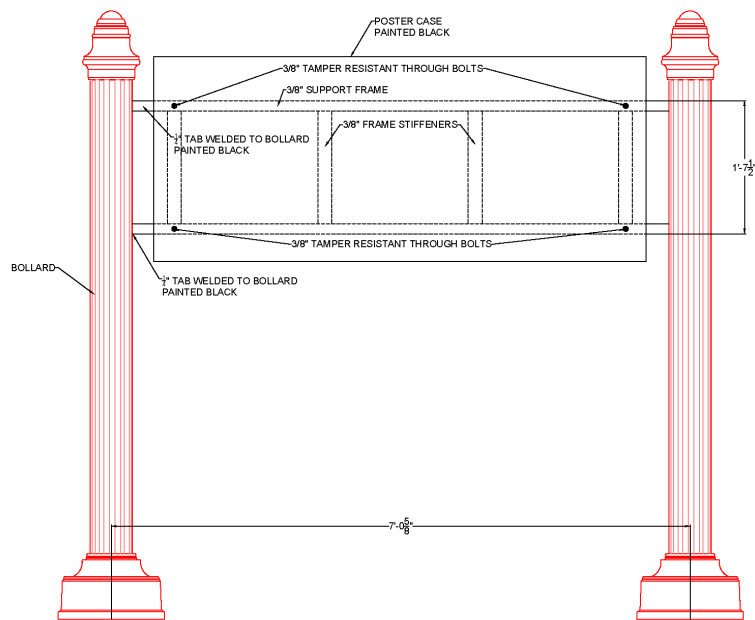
EXHIBIT: PROPOSED "GATEWAY SIGN" RENDERING
